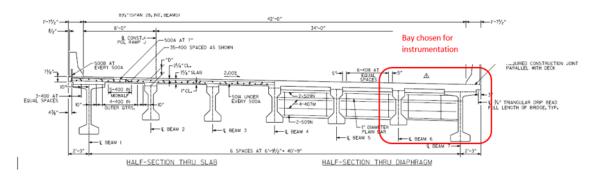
Engineering Drawing. Half-Section Span 27RT, Bridge 11B
